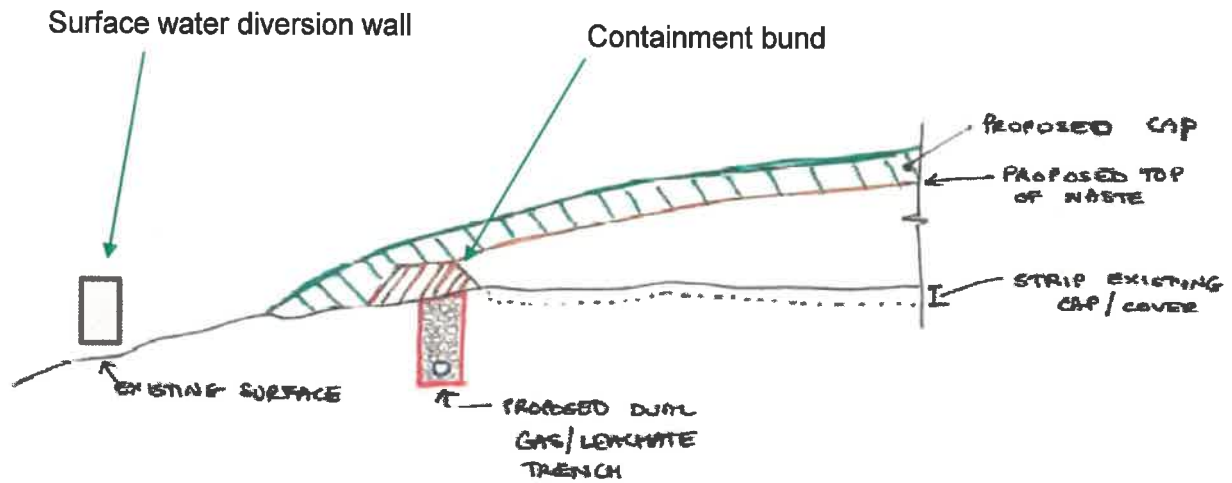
Proposed dual gas/leachate trench typical arrangement
